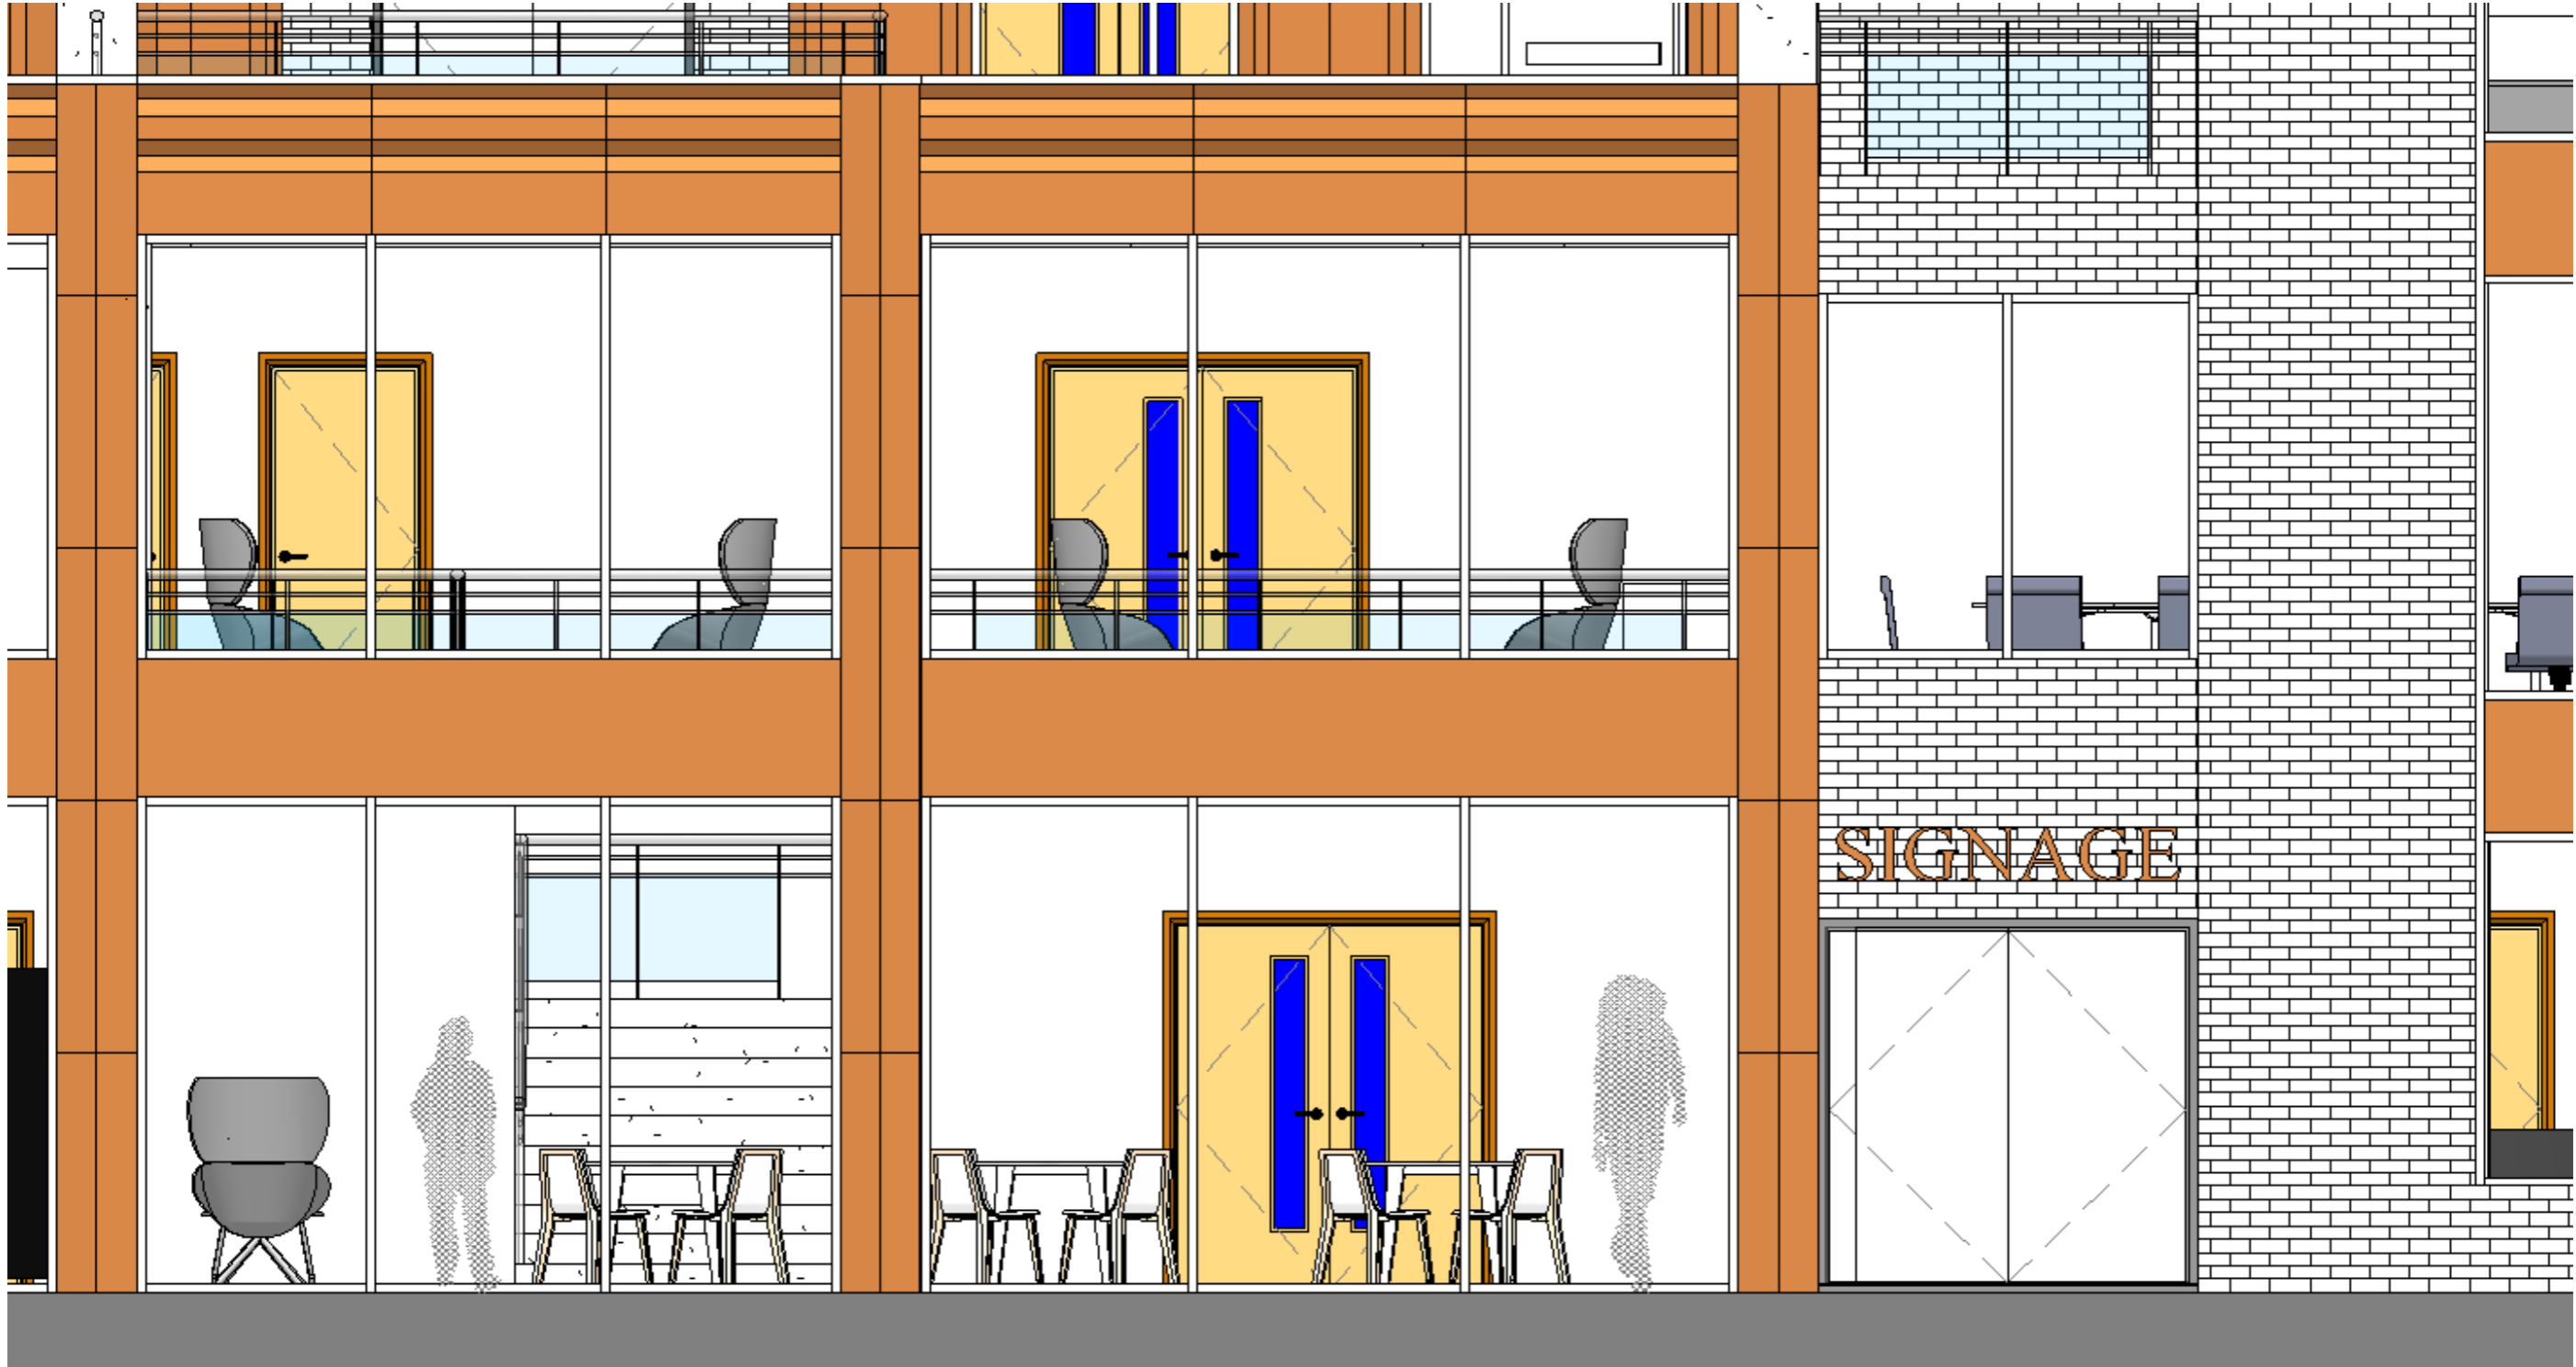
Enlarged Entrance Elevation (Author, 2021)
